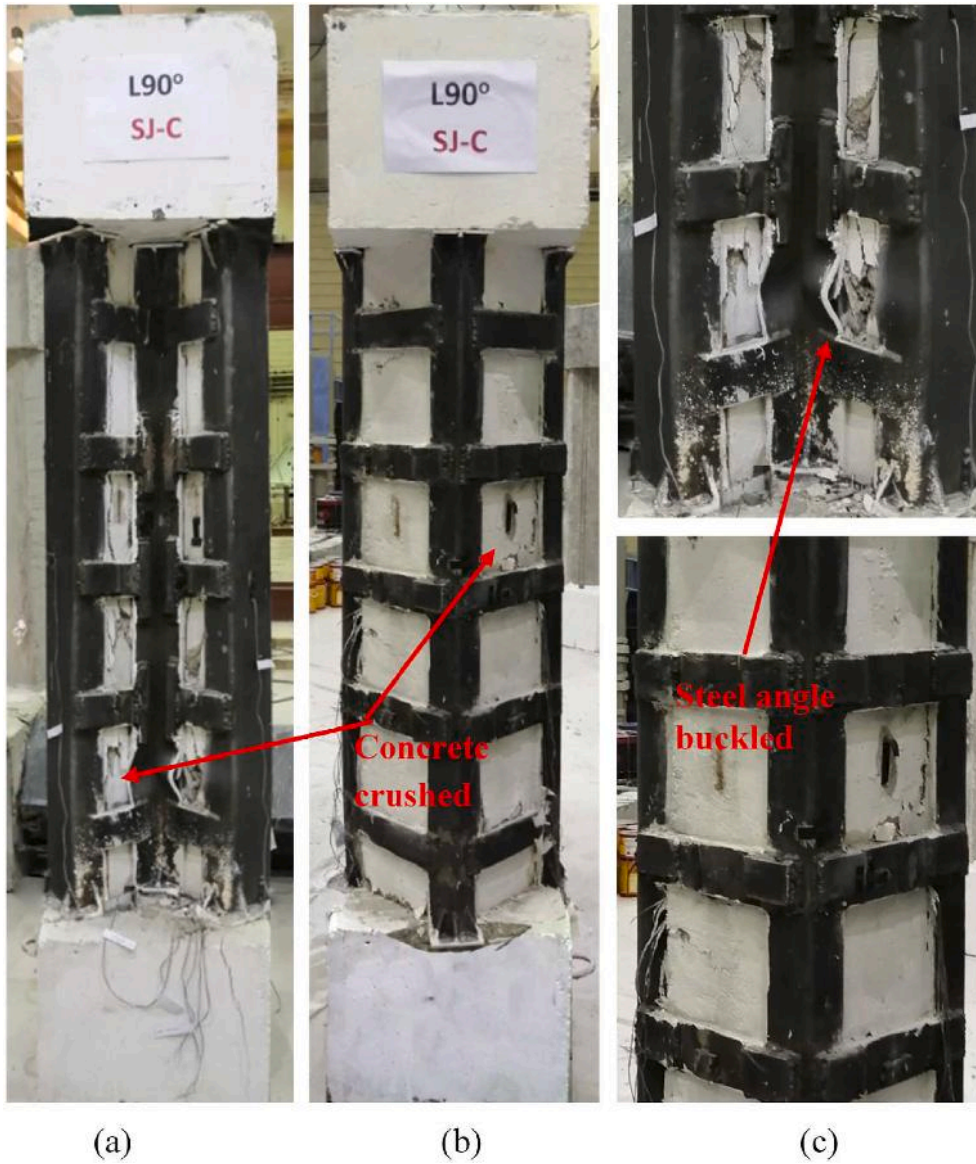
Failure of specimen L90-SJ-C: (a) Elevation view; (b) Rear view; (c) Close view.
